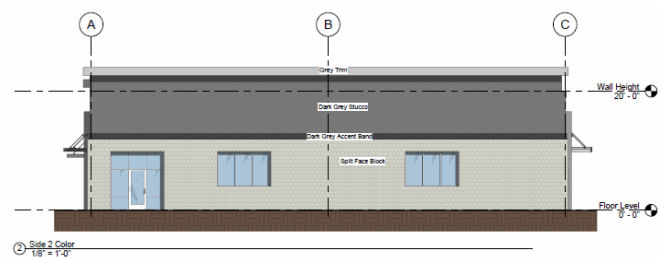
Restaurant/retail with drive-thru side elevation.
